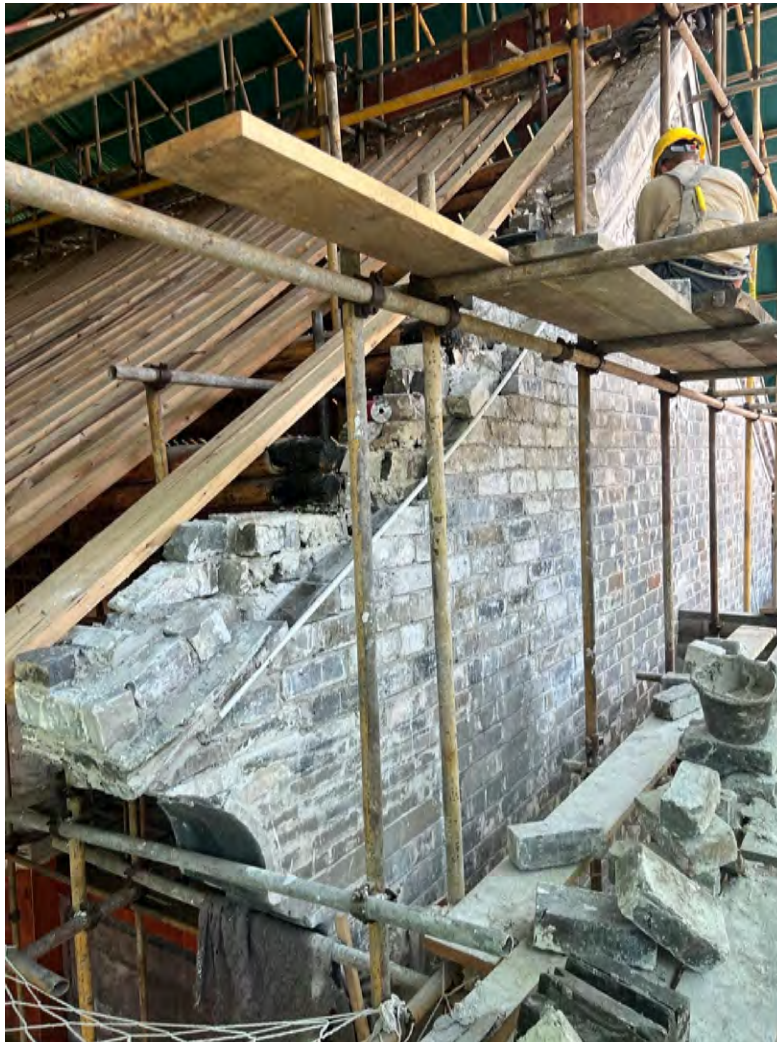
Wall reinforcement used in Chunyang Guan. Photo by Author.
